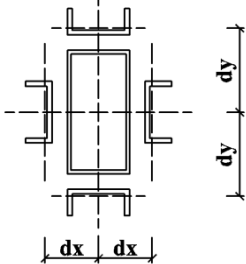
Layout of the Cross Section of the Column of the Bridge Model
